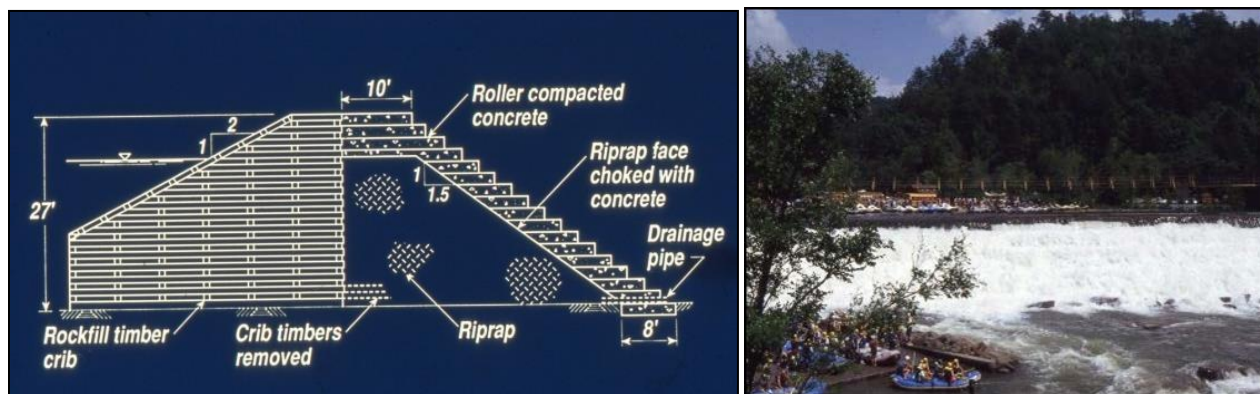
Ocoee No. 2 Dam, TN – Typical Section and Flow Over RCC Protection
